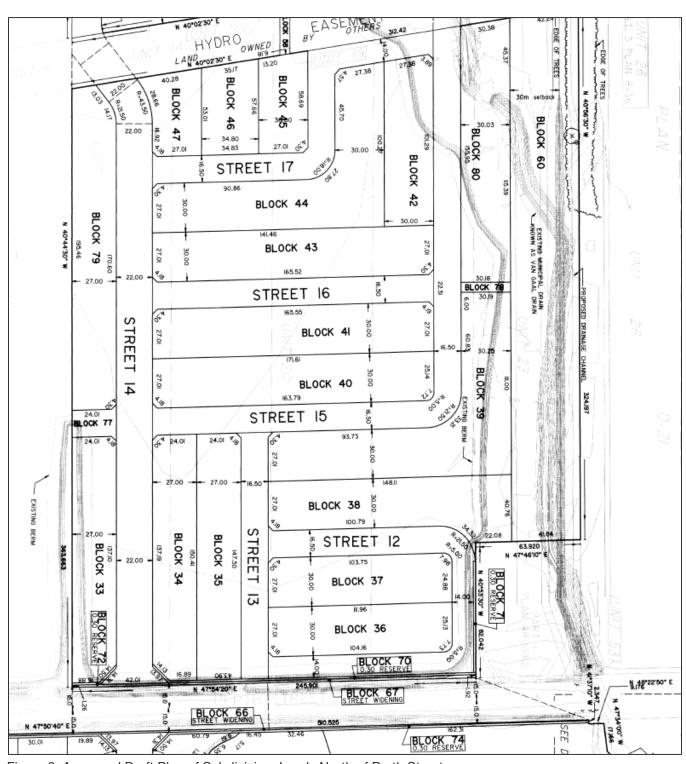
Approved Draft Plan of Subdivision, Lands North of Perth Street
